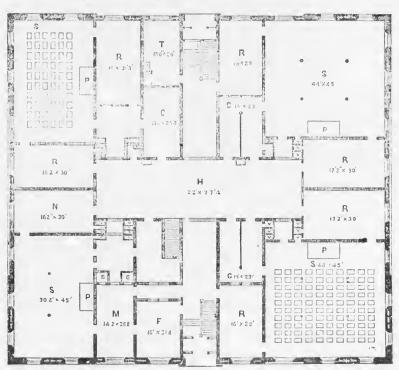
PLAN OF GROUND FLOOR, ADAPTED TO FIG. 197.
